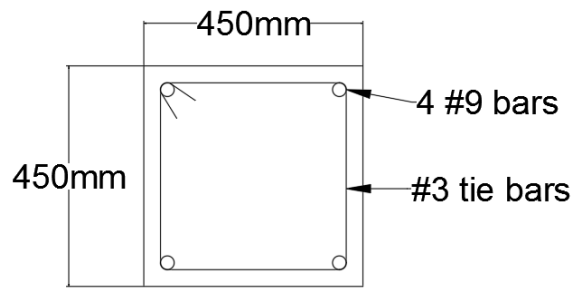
Column Cross-sections of CC, CEX and CI for all floors
